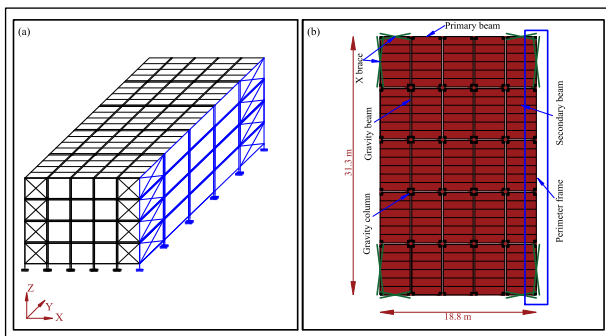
(a) 3-dimension view of the four-story building (b) plan view of the considered building.
